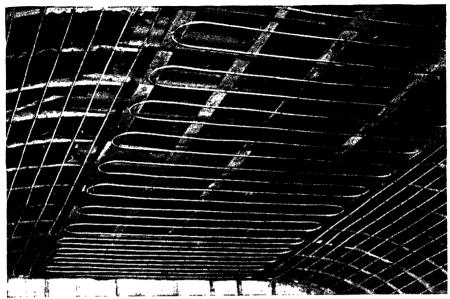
Arched ceiling construction. (Chase Brass & Copper Co., Inc.)
